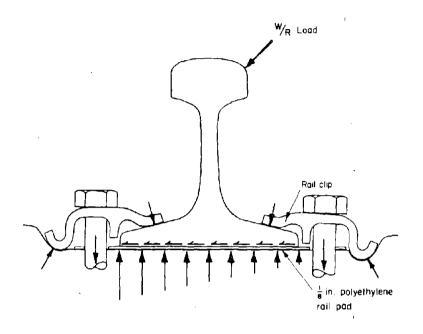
FASTENER LOAD DISTRIBUTION
